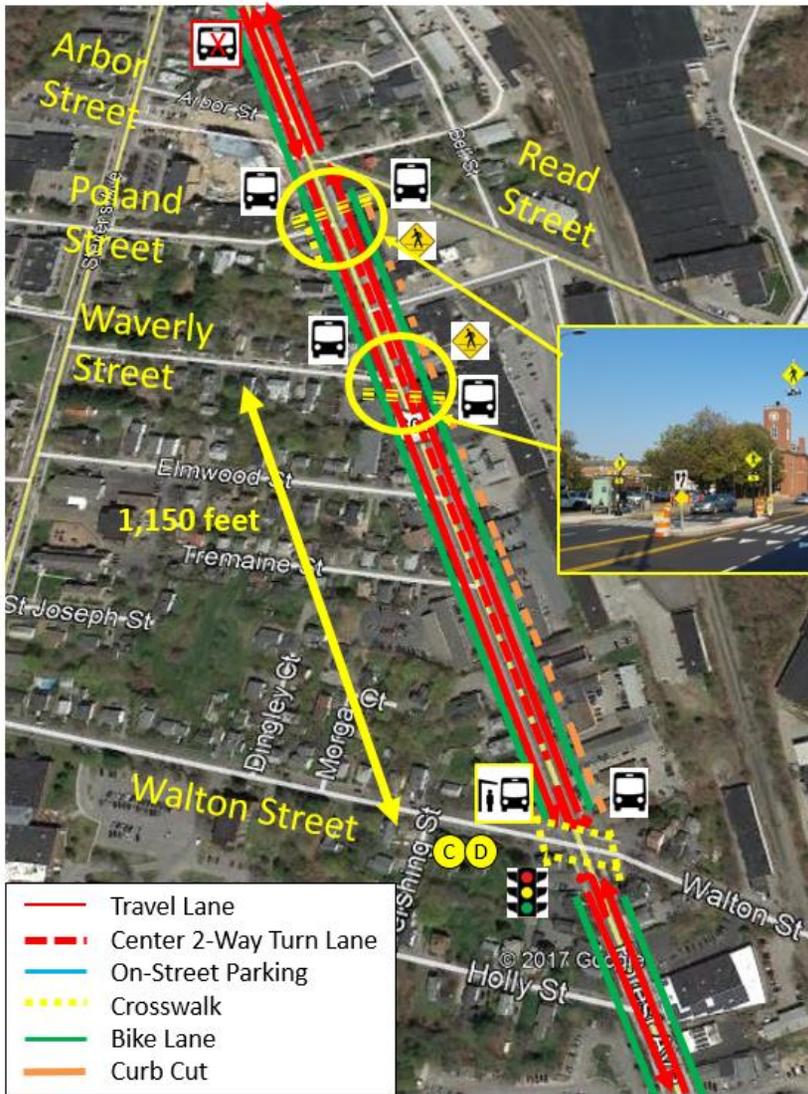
Morrill's Corner to Walton Street — Improvements Evaluated
